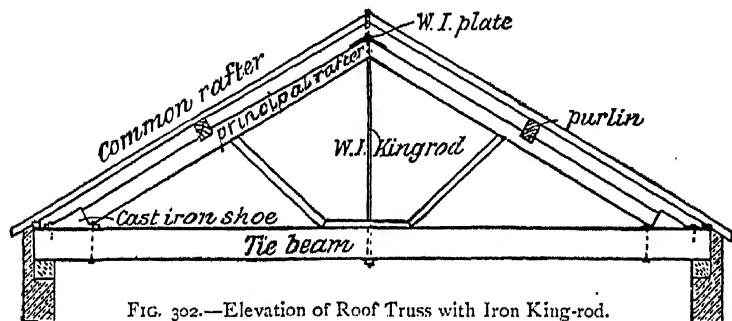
Elevation of Roof Truss with Iron King-rod.
